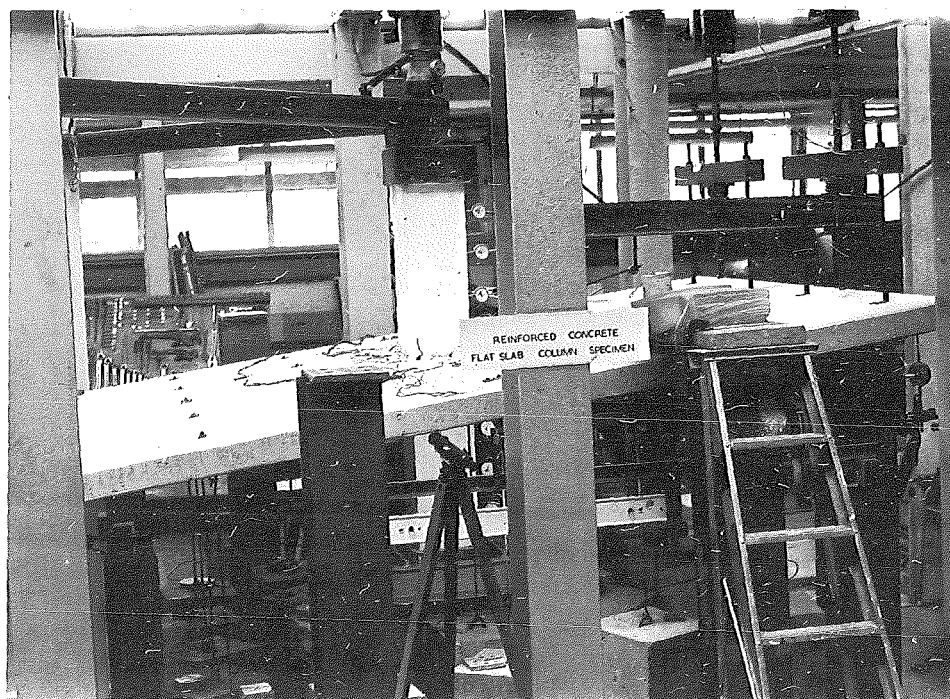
DEFLECTED SHAPE OF SPECIMEN 7CS AFTER TEST
